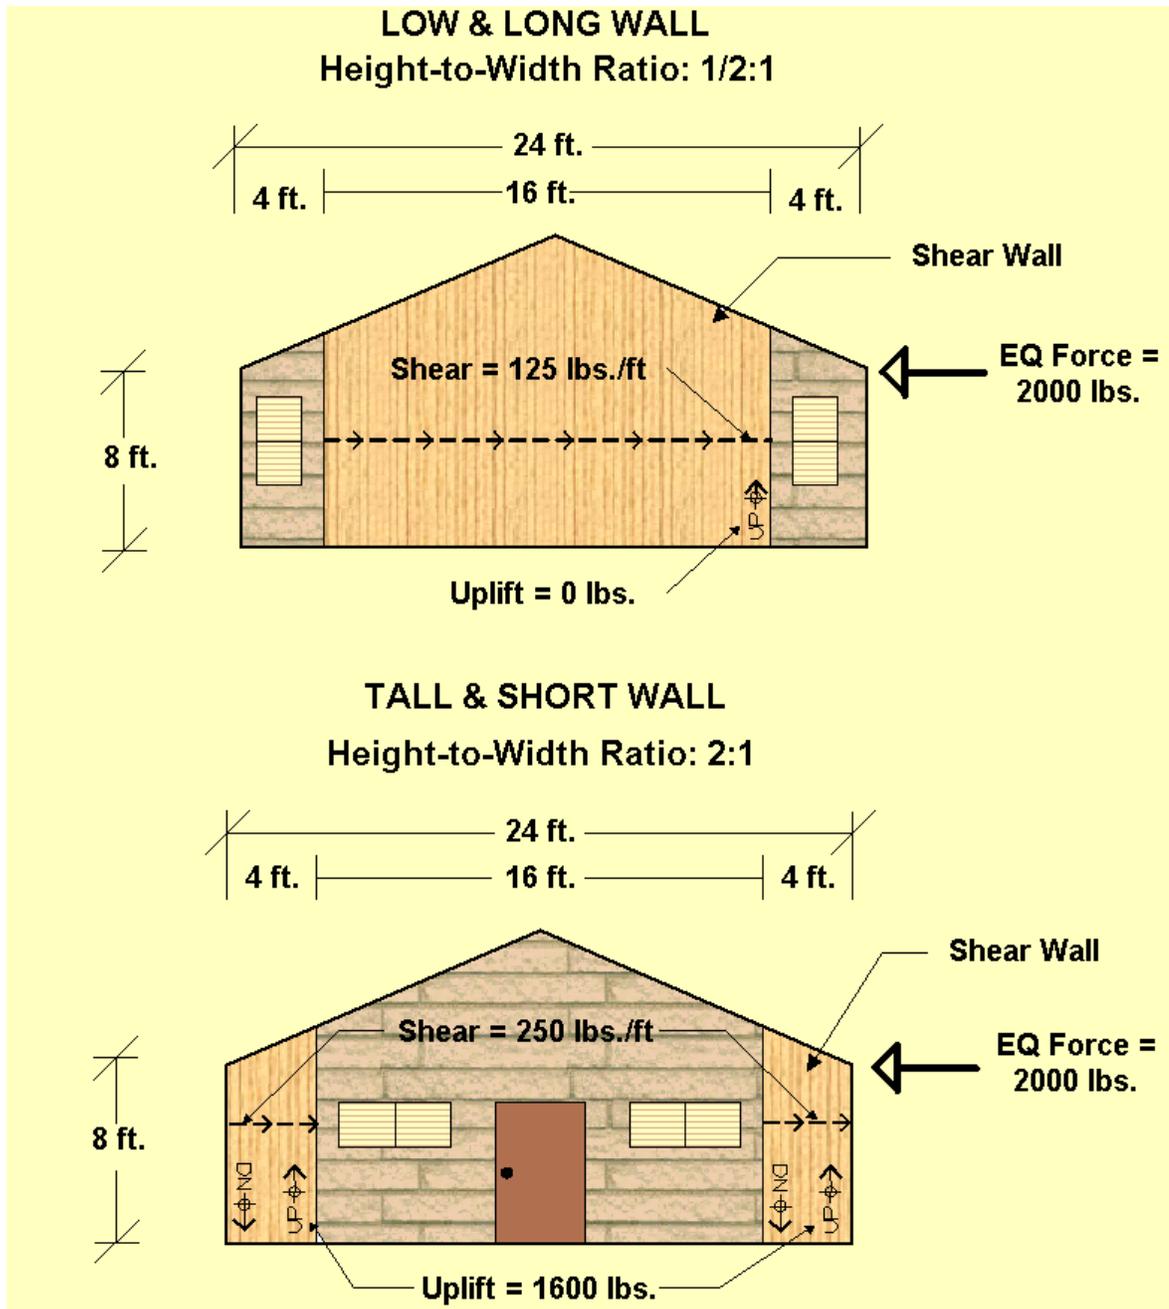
How Shear Wall Length Changes Shear & Uplift
